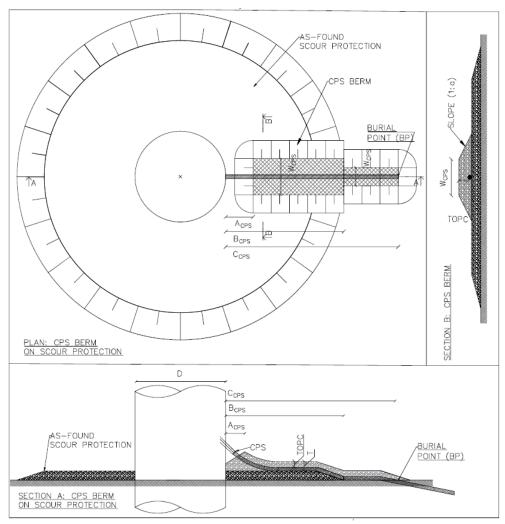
Design drawing. Cable protection system (CPS) with rock berms on the existing scour protection. Generic plan and section views [2].
